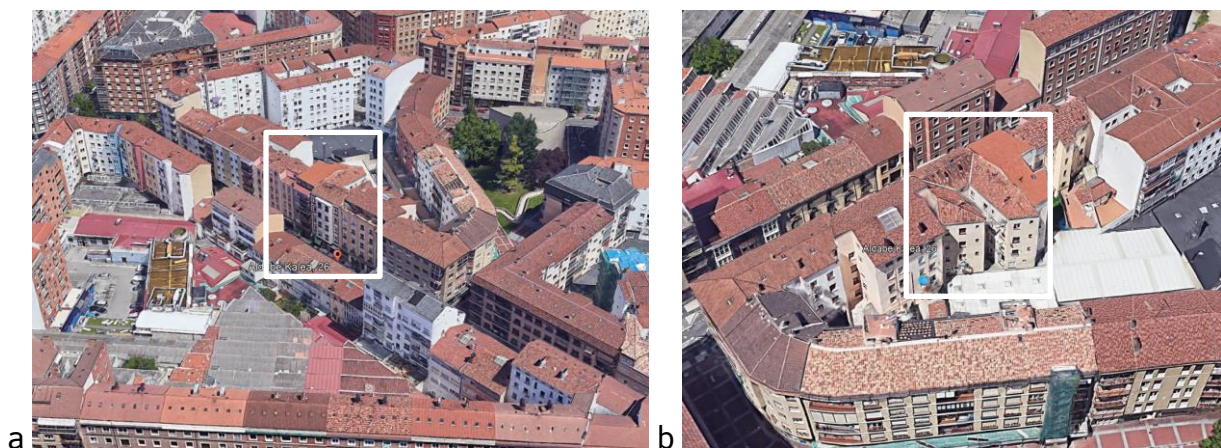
Aerial views of the urban context and building location. a) main facade; b) rear façade.
